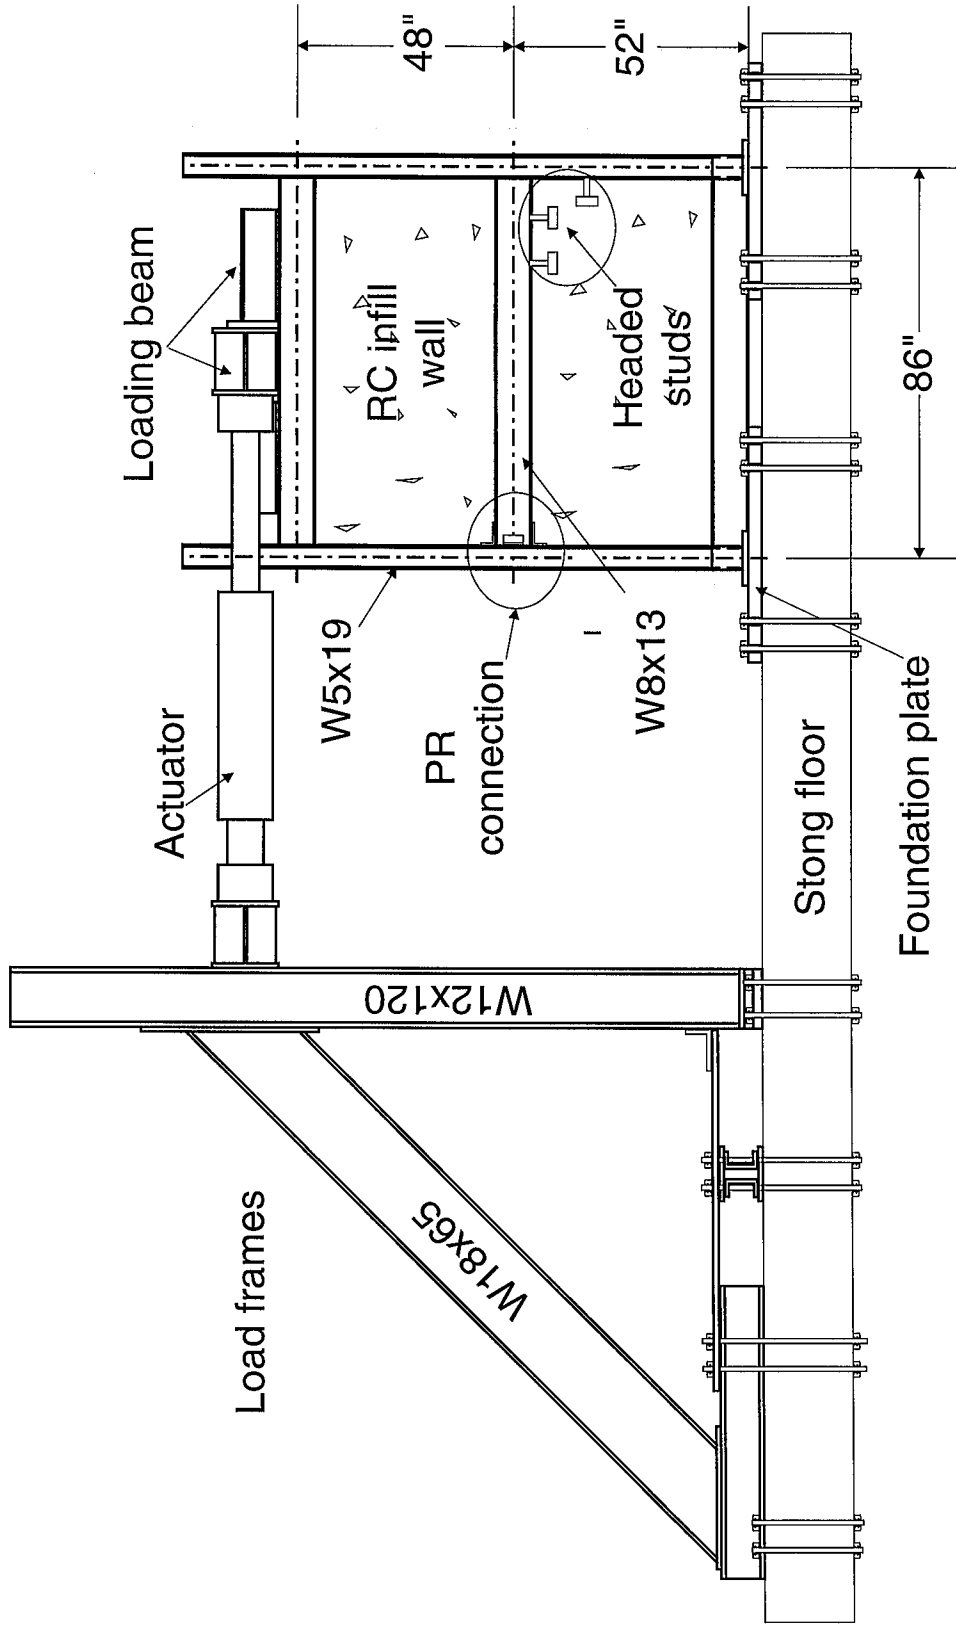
Specimen Dimensions and Test Setup
